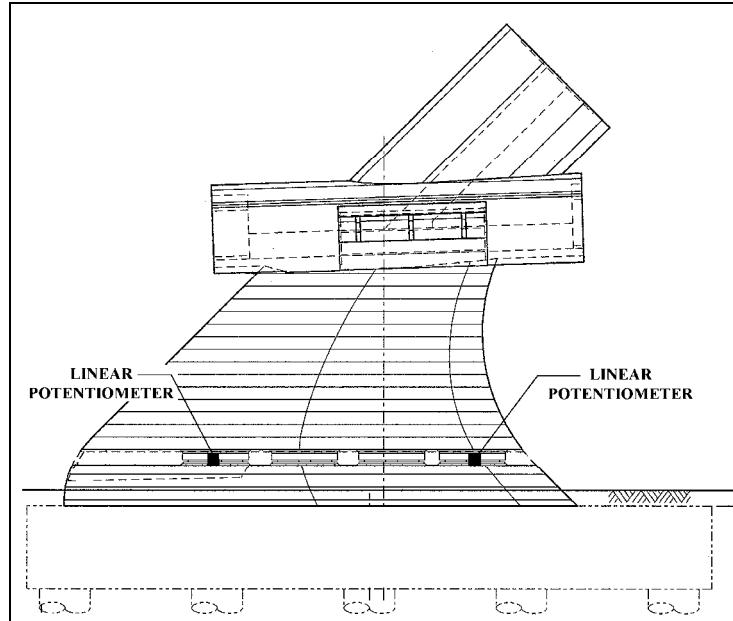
Linear Potentiometer Locations (Elevation View) (Modified IRIB Specifications and Construction Plans)
